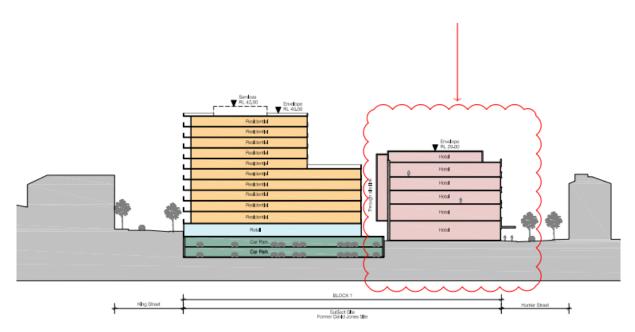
Long Section through the Block 1 (Stage 1) with modified building envelope of the Former David Jones Building 2 (Source: SJB Architects)
